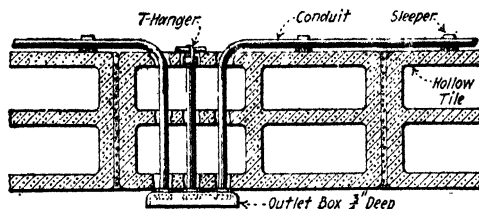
Third step, shallow outlet box clamped in place with lock nuts.
